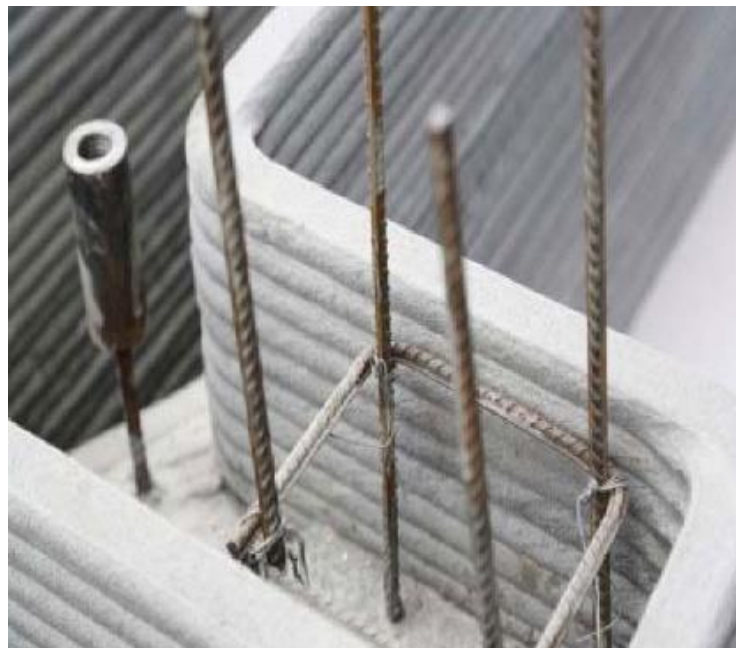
Steel Reinforcement for a 3D-printed wall[43]
